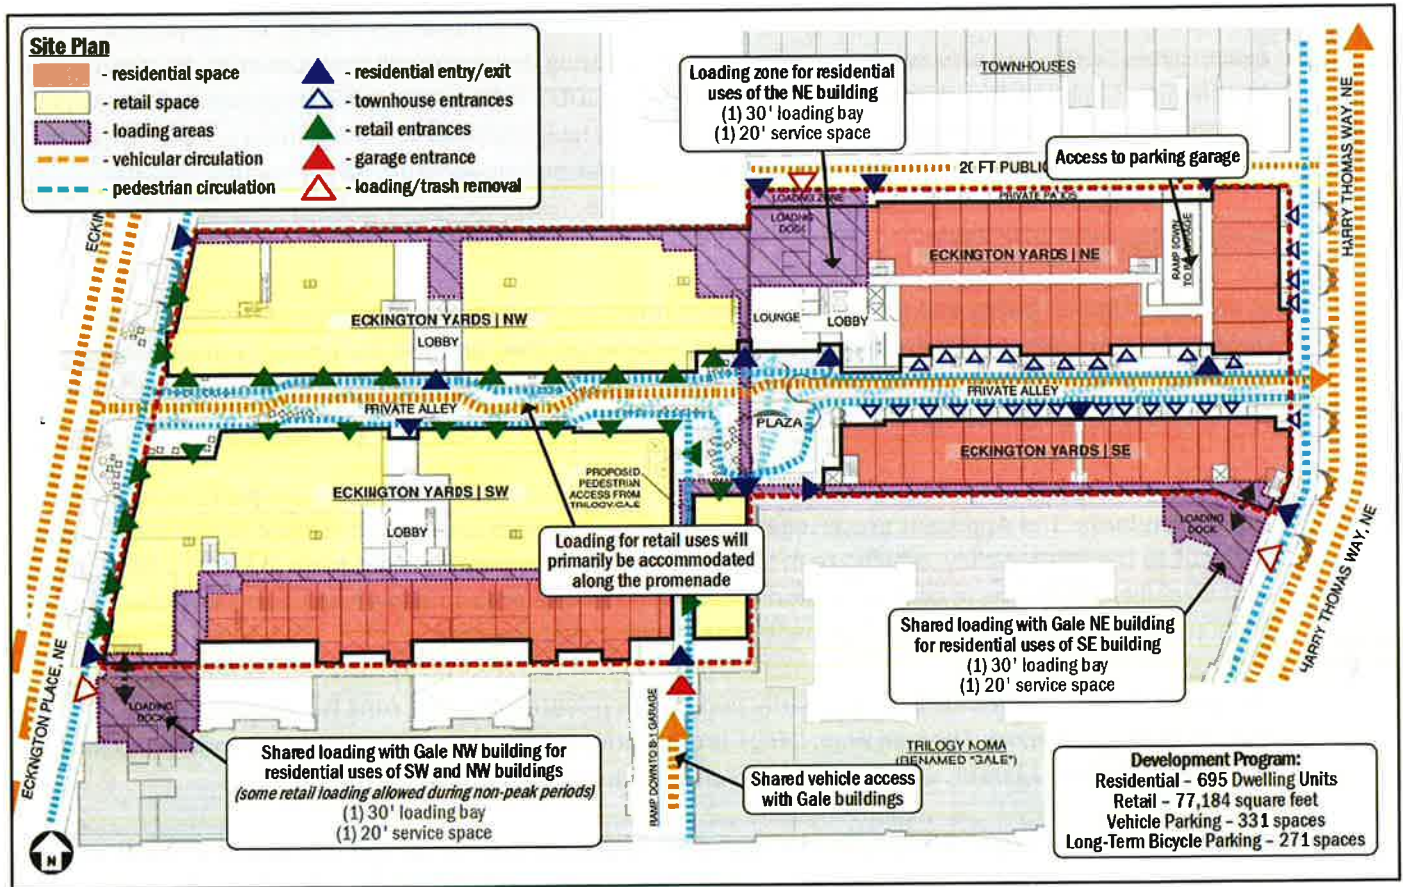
Site Design and Access (Source: Grove/Slade Associates)
